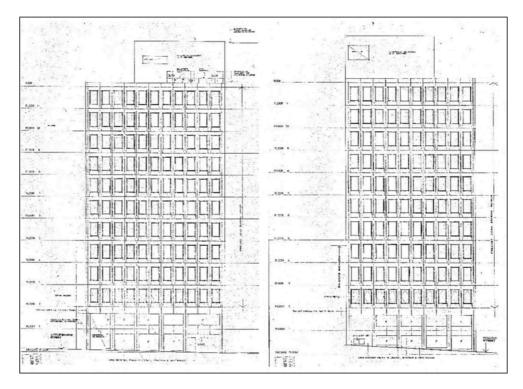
The principal west (L) and north (R) elevations of the building at 178-188 William Street, Melbourne, c1972. Source: Building Application Plans, CoM, from citation.
